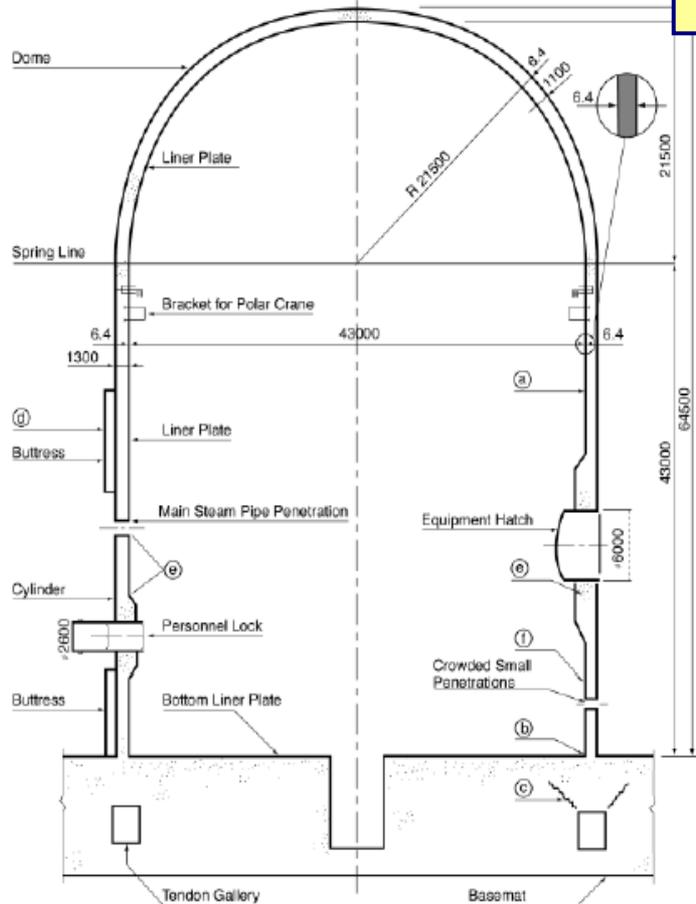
Elevation of PCCV Prototype and Potential Failure Locations
